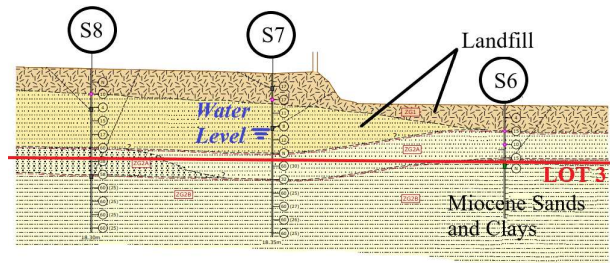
Site investigation geotechnical profile (Section Cut JJ' from S8 to S6 at lot 3).
